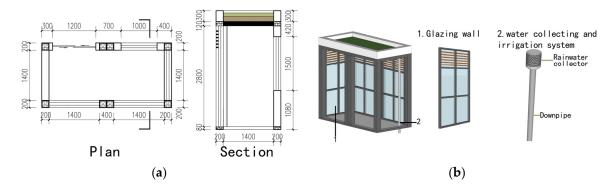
(a) Size of impounding planting roof block; (b) components of the impounding planting roof block.
